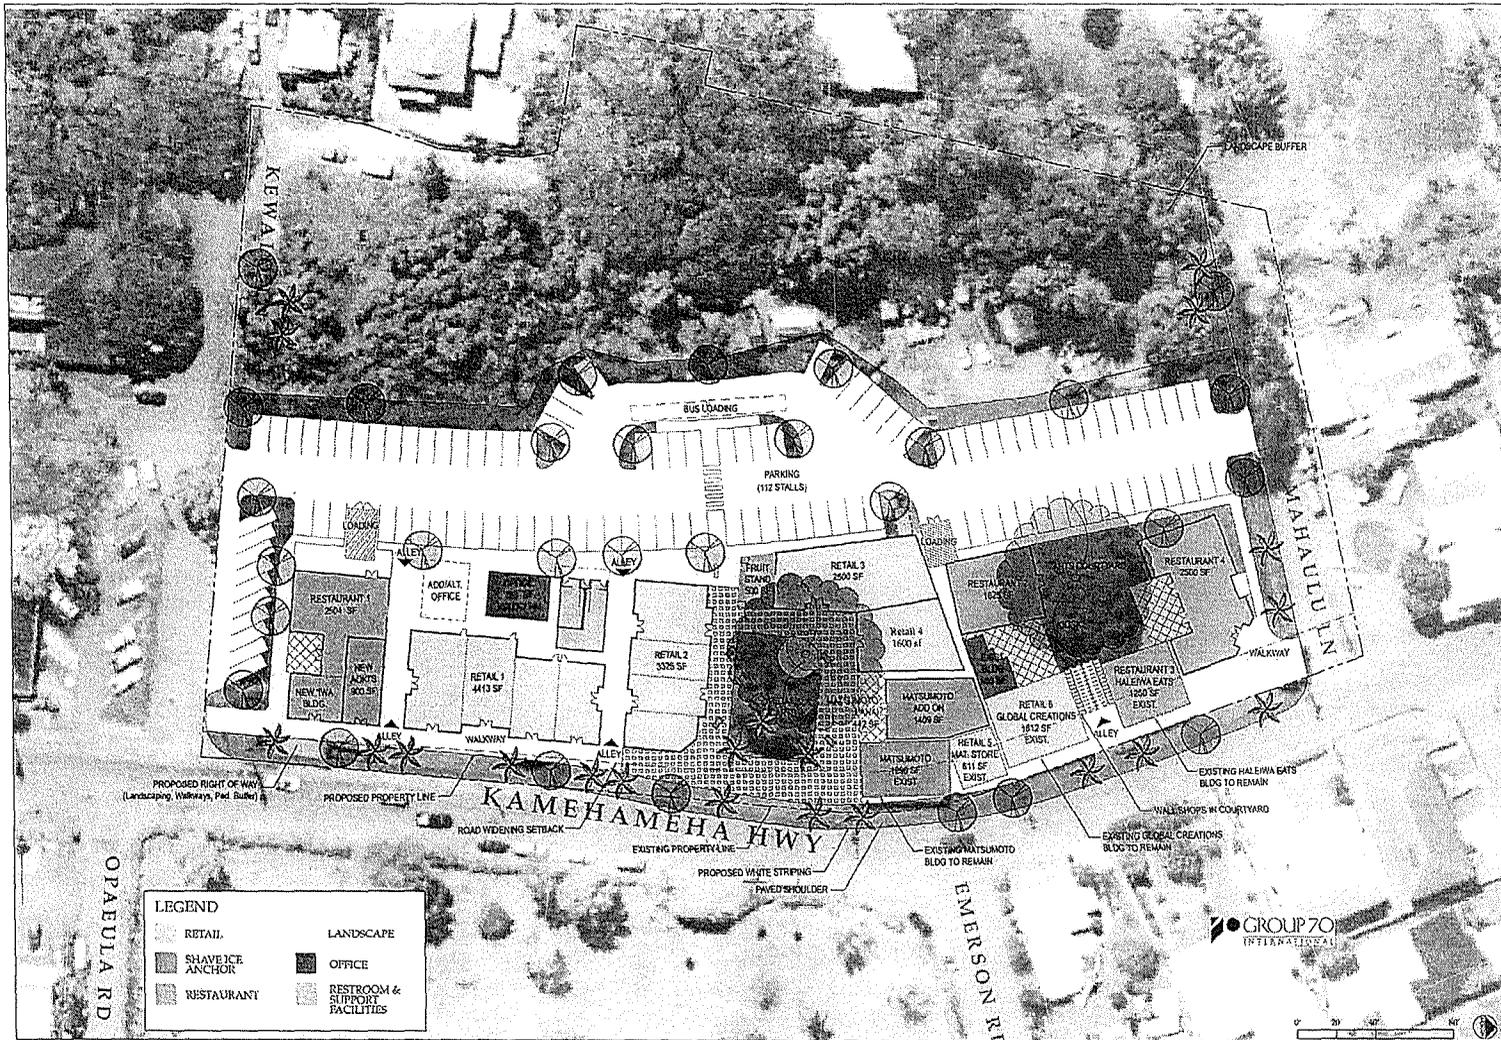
Hale'iwa Commercial Redevelopment Conceptual Site Plan (subject to change)
